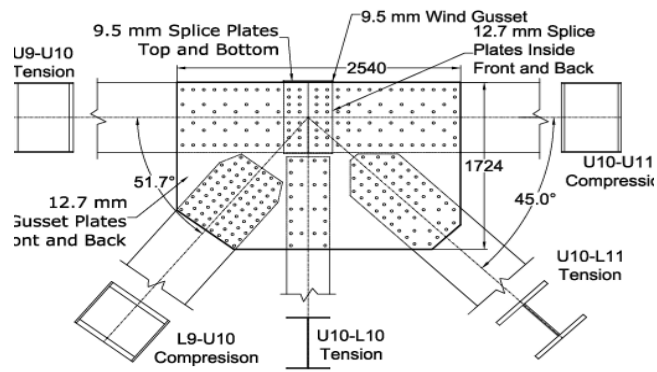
Dimensions of the gusset plate joint (Liao and Okazaki, 2009)
